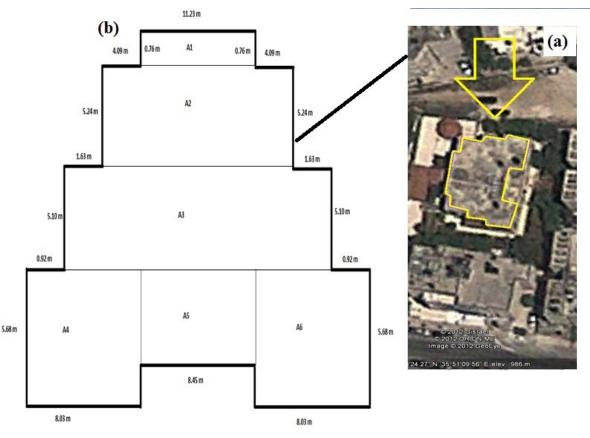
An example area correction factor for a building roof top; a) Digitized building roof top, b) Actual measured building rooftop
